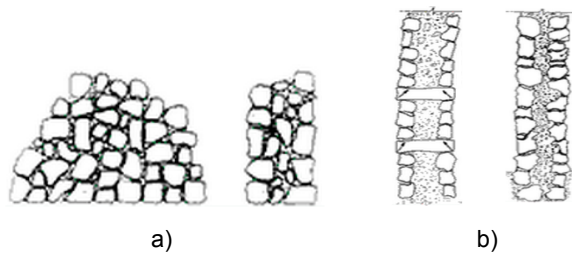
Composition of old masonry walls (Jones, 2002): a) Rubble stone masonry; b) Multi-leaf walls connected on the transverse direction by larger stones, iron ties or timber joists.
